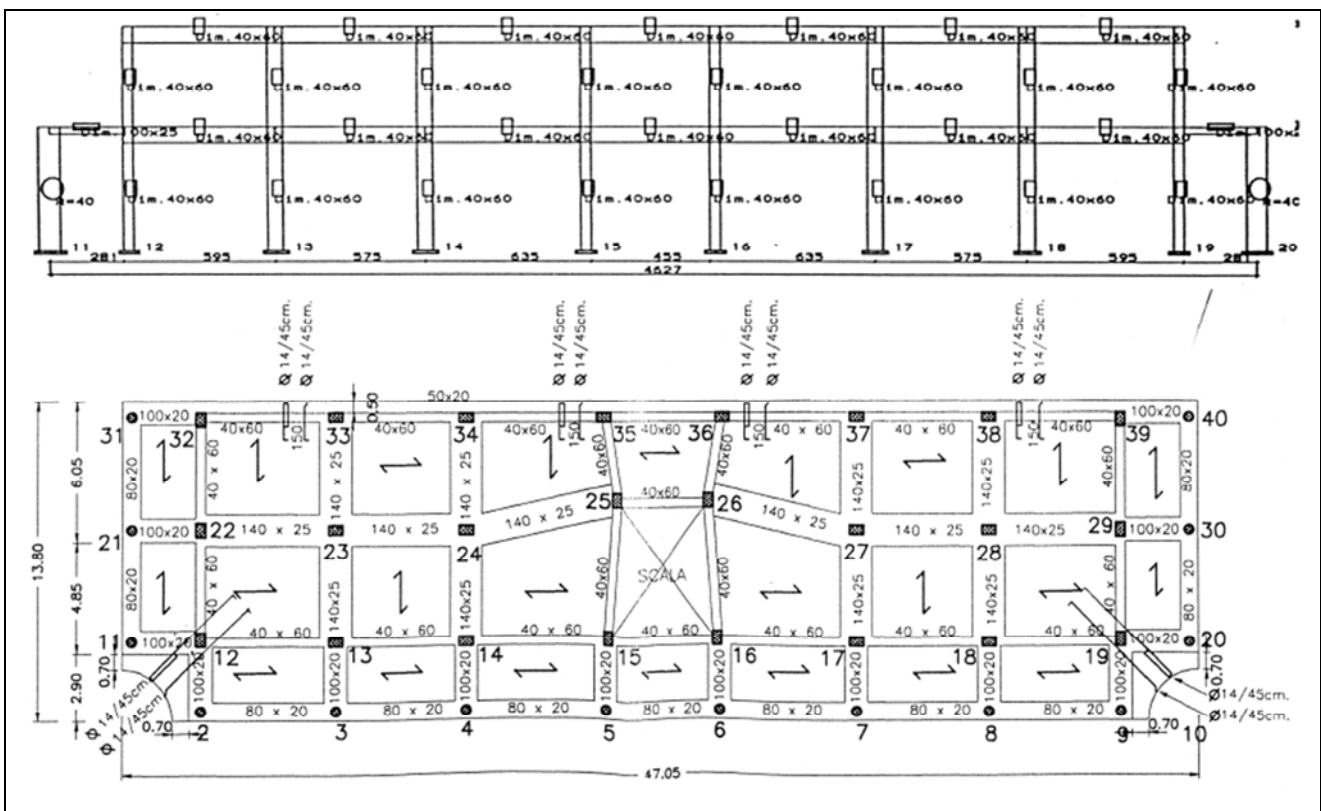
Prospective drawing (above); plan of the first floor (below)
